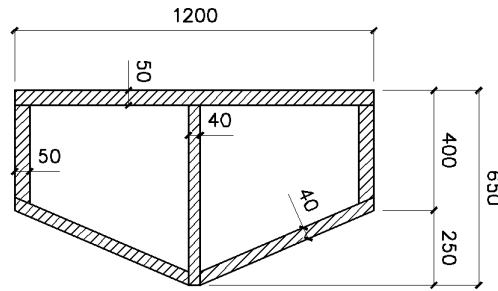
Elevation showing the original design of the arch's cross-section of the bridge over the Carpi's highway station. The section is constant along its entire development.
